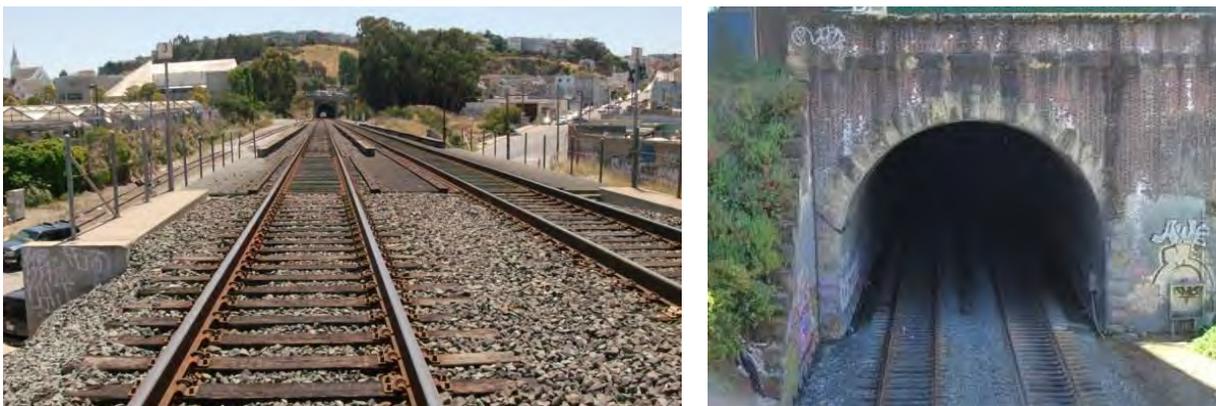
Two of the Caltrain Tunnels paved with Asphalt just south of San Francisco. Tunnel 4 (left) and Tunnel 2 (right.).
